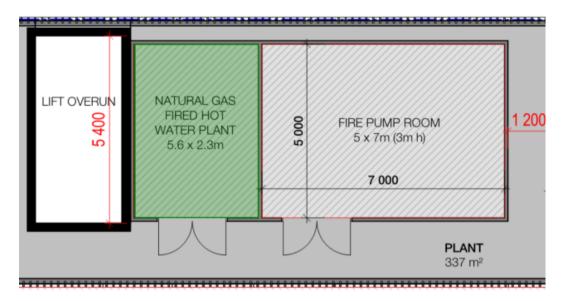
Roof Level Domestic Hot Water Plant Room
